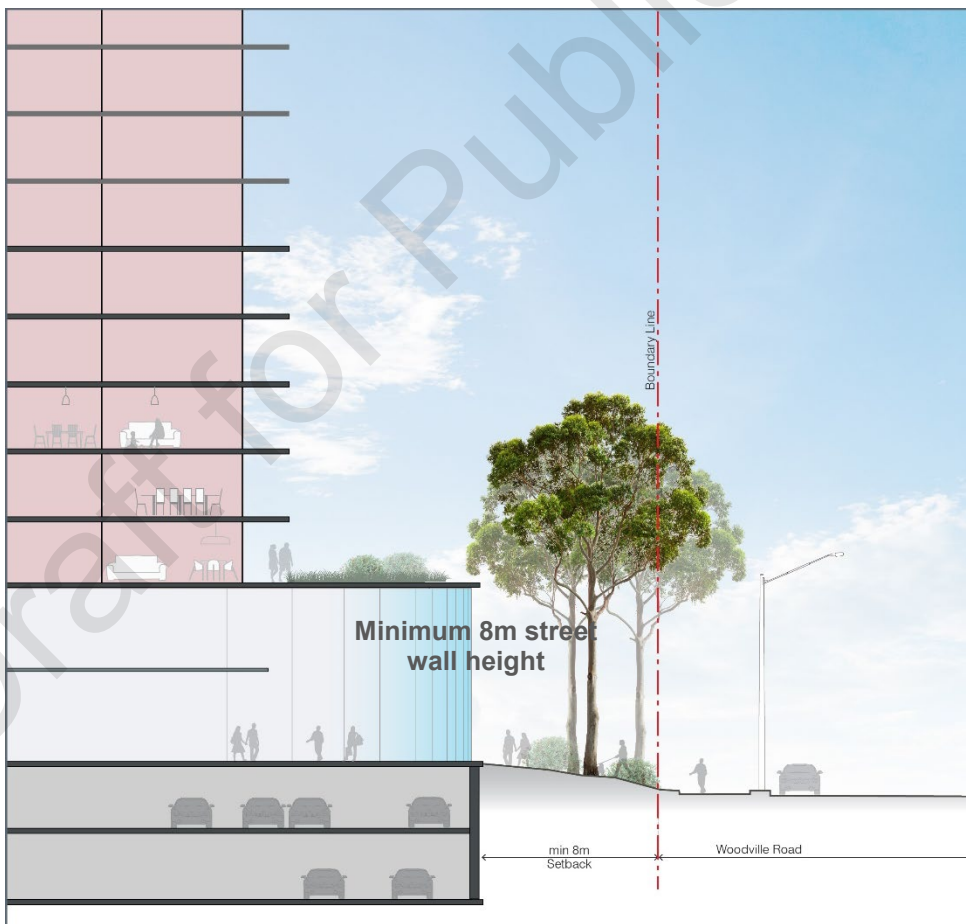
Illustrative section – Minimum street wall height for buildings on Woodville Road
